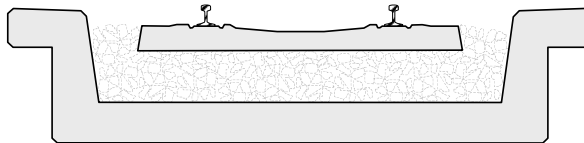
Typical section for a Swedish concrete railway trough bridge. The trough, filled with ballast, consists of a slab connected to two longitudinal beams, Nilsson<sup>5</sup>.
